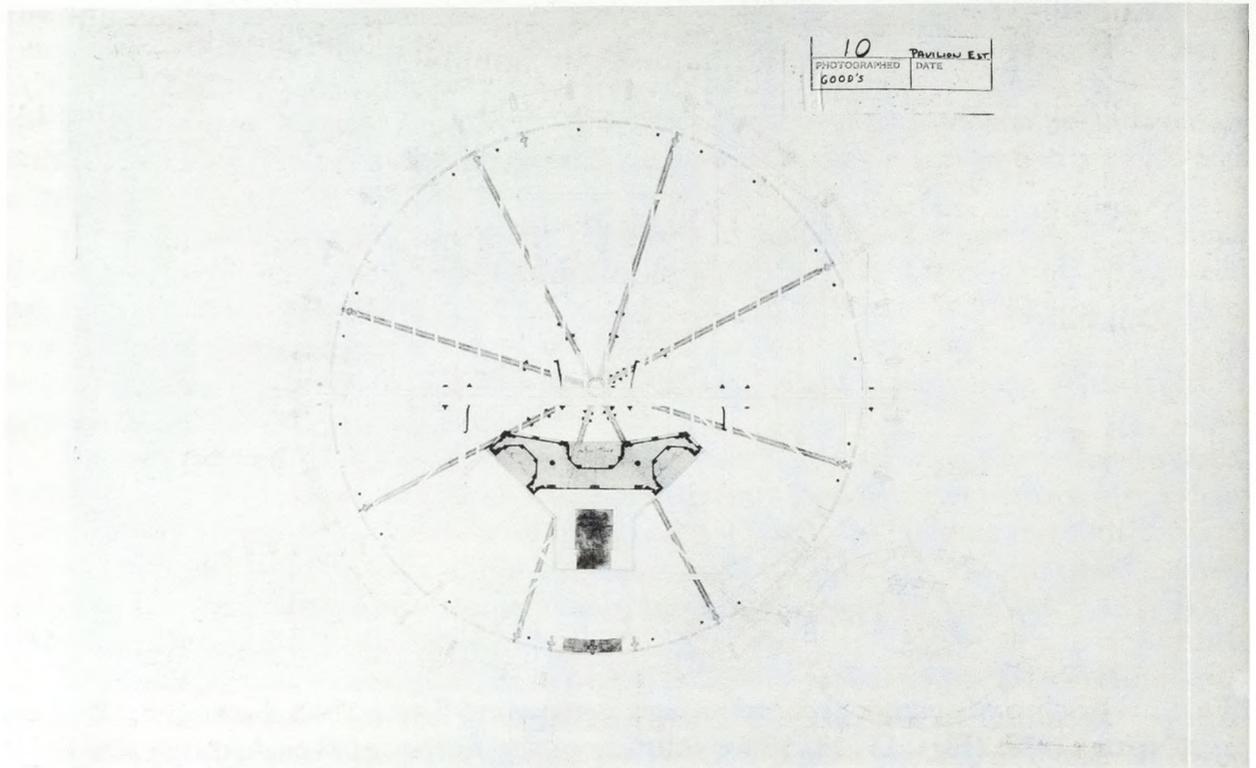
Brighton Pavilion, plan of second floor above Saloon, drawing by William Nixon, 1827
